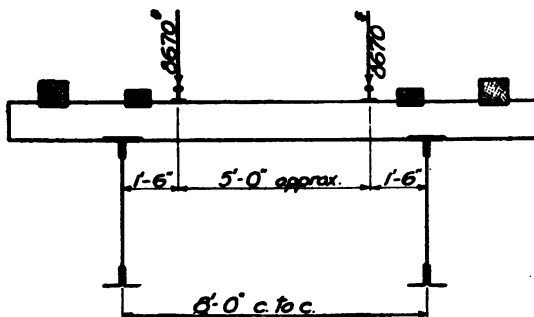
MAXIMUM LOADING ON CROSS-TIES
